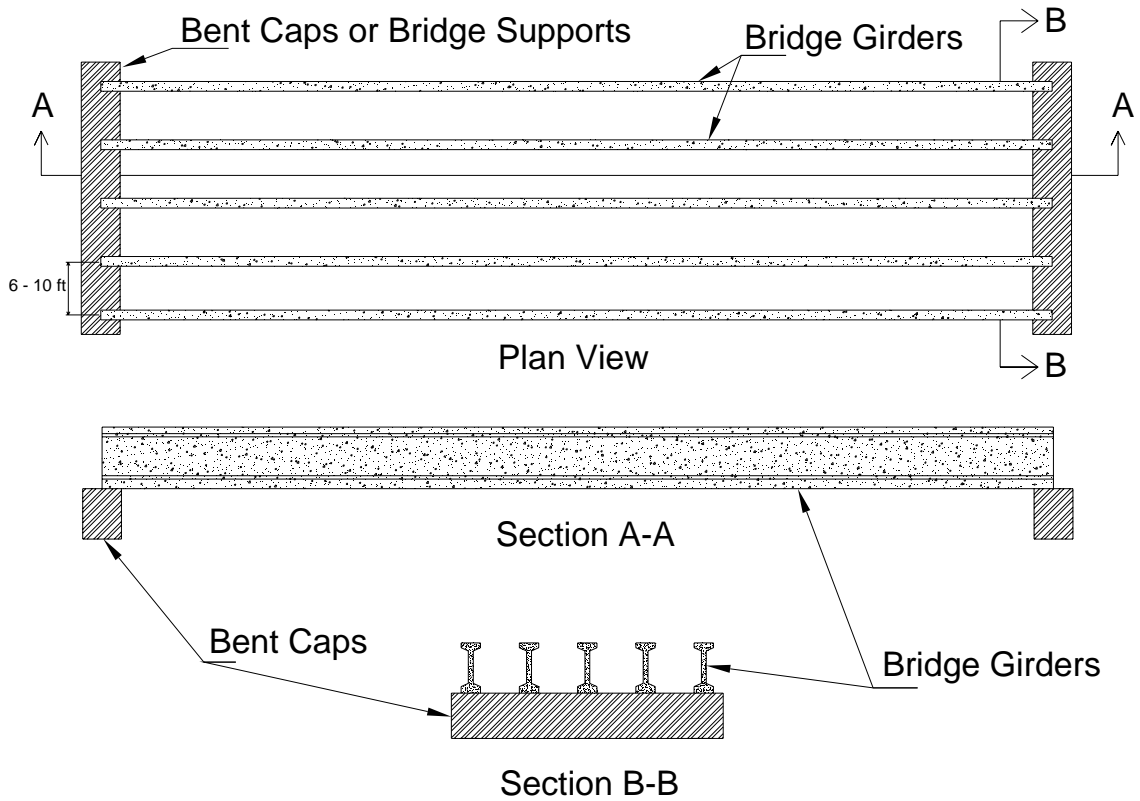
Typical Prestressed Concrete Bridge Construction Prior to Placing Bridge Deck
